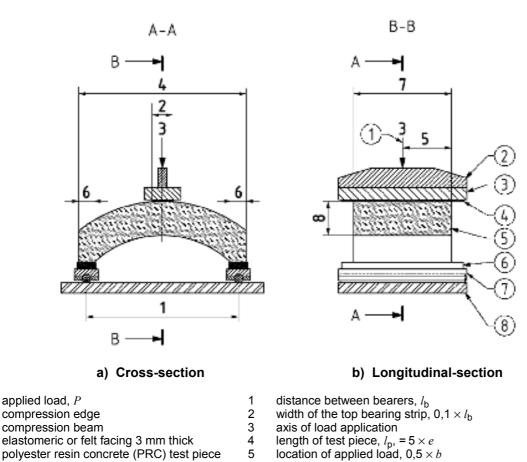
Test arrangement when using test pieces taken from a pipe
